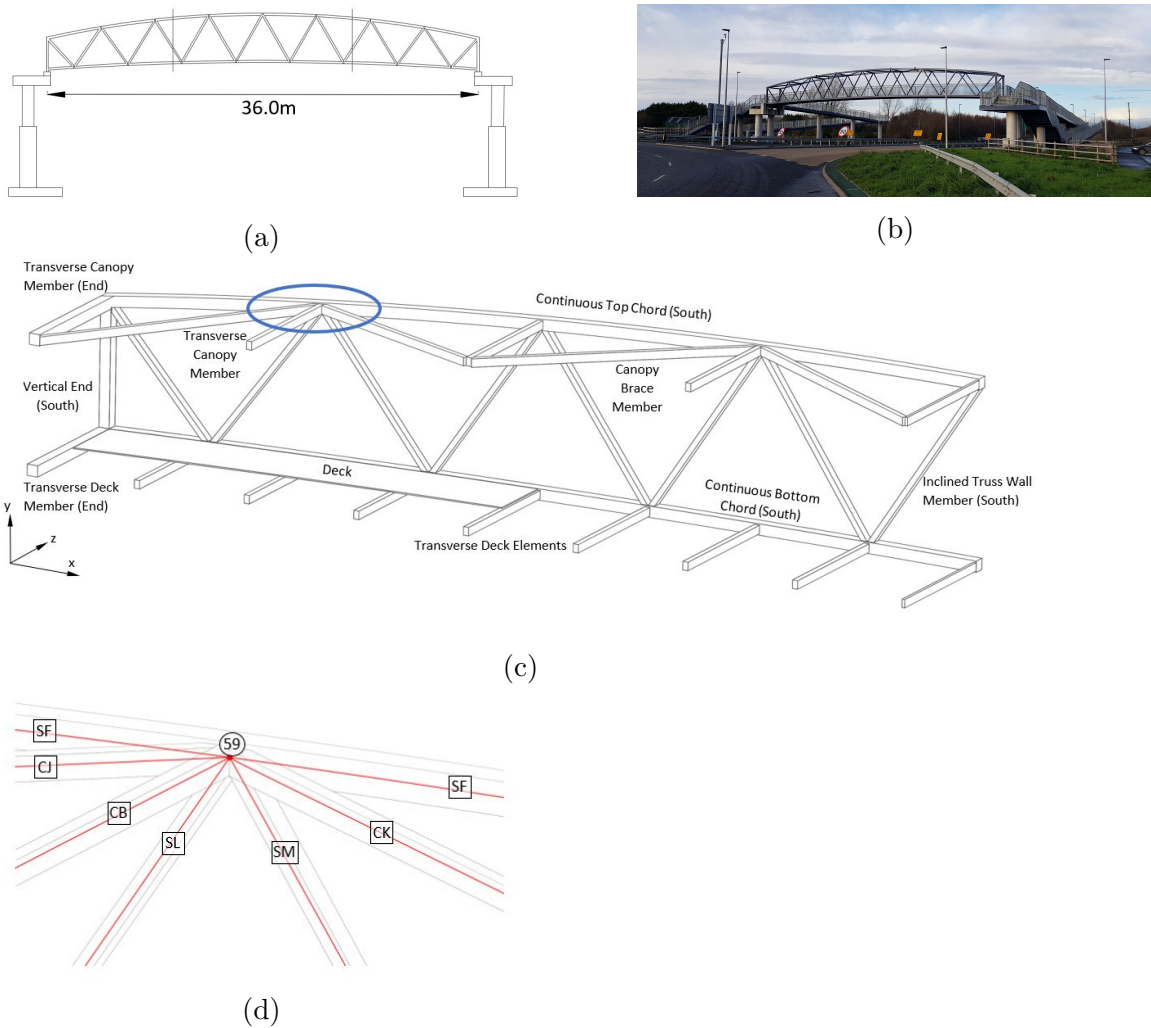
Truss footbridge: (a) elevation of bridge showing span, (b) photo of bridge elevation, (c) annotated stepped section of the bridge with top chord joint highlighted in blue and (d) zoomed and greyed out view of circled joint in (c) with element centroids drawn in red, joint location marked with red dot and element and joint IDs labelled (square and circle respectively)
